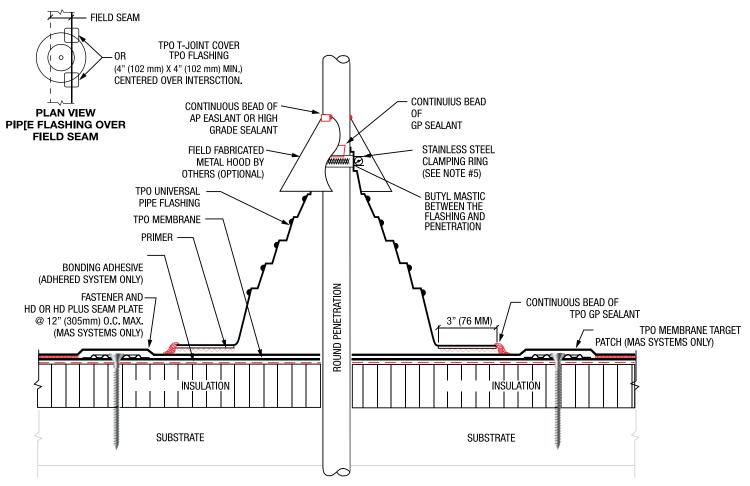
Standard prefabricated pipe boot penetration flashing detail.
